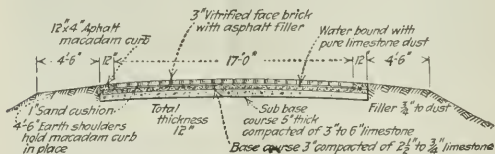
CROSS-SECTION OF BRICK ROAD WITH PENETRATION CURBS
